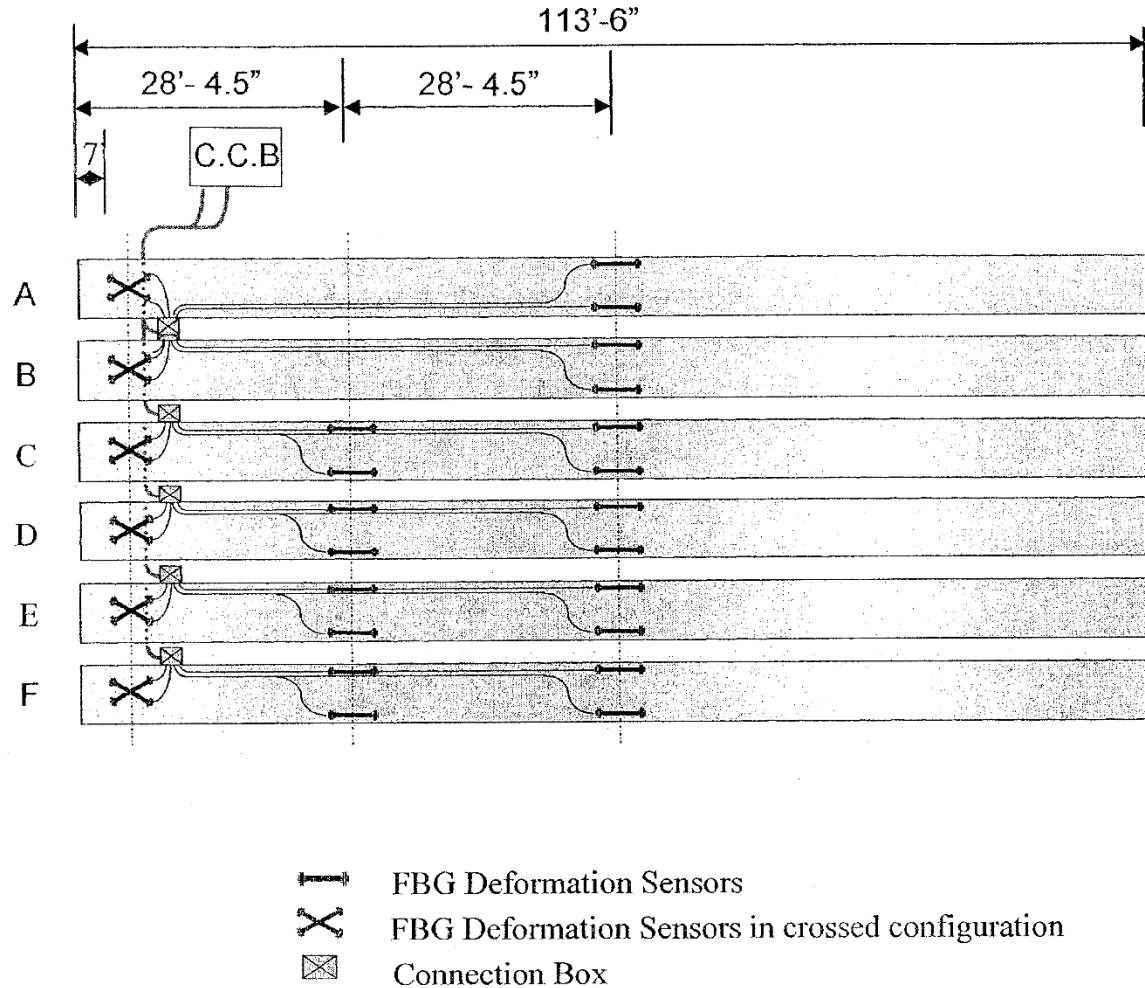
Bridge 9336 instrumentation layout (Liang 2008).
